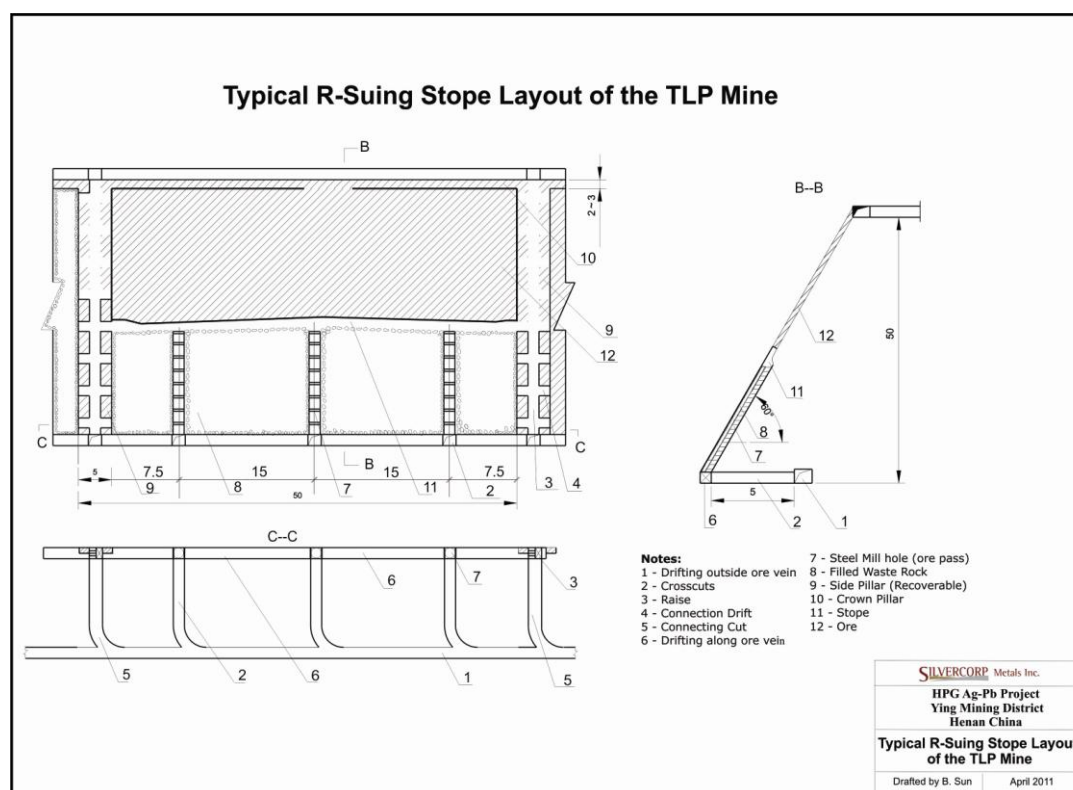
Typical R-Suing Stope Layout of TLP and LM Mines
